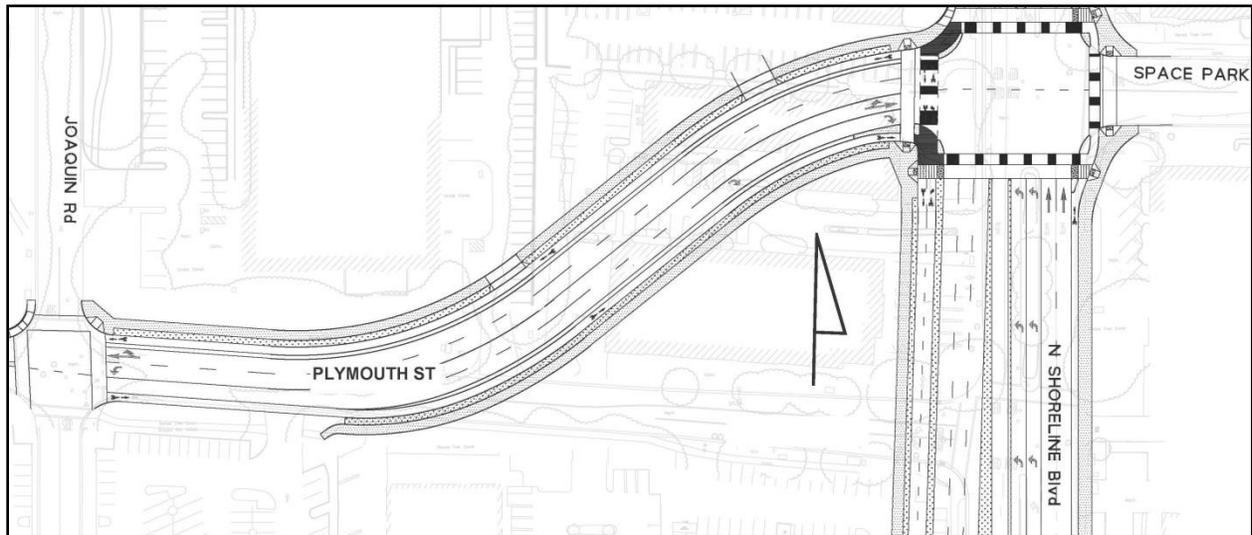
Conceptual Plymouth Street-Space Park Way Realignment Improvements
